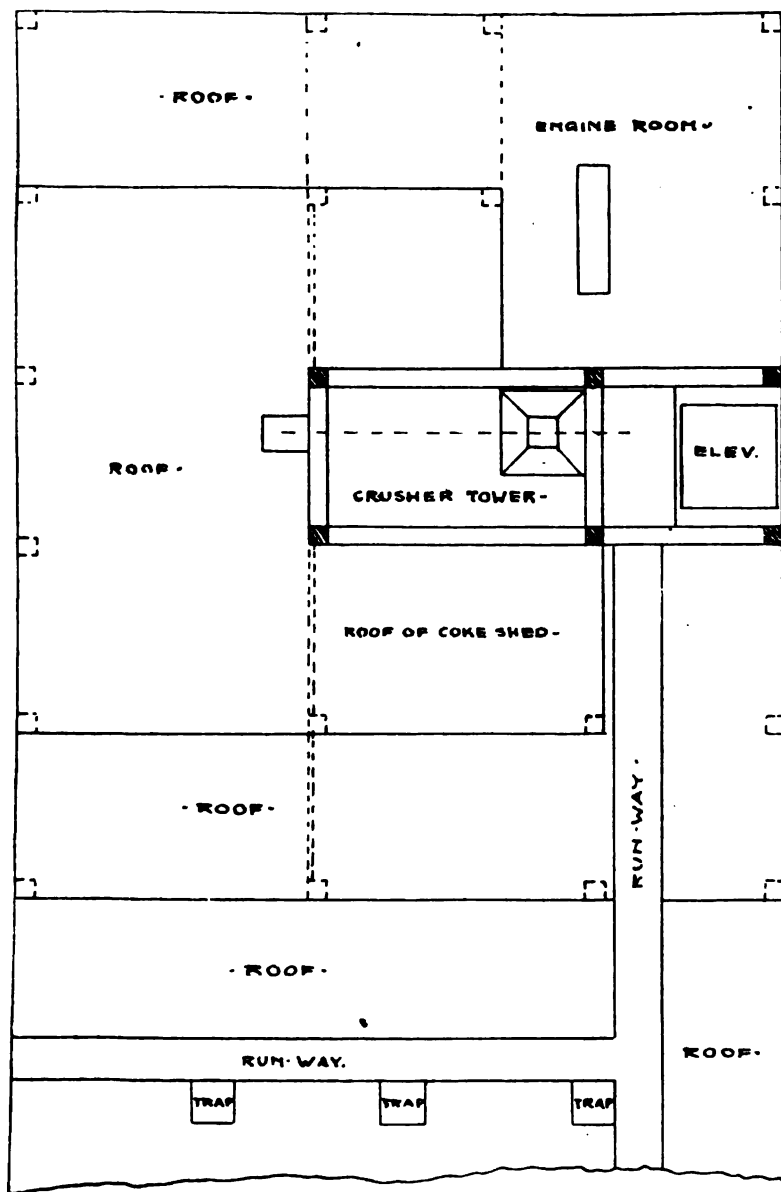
PLAN SHOWING LOCATION OF CRUSHER TOWER.
